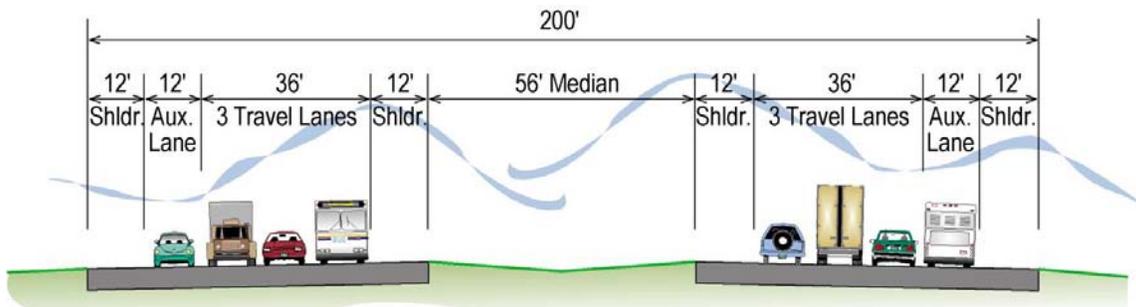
Package A Typical I-25 Cross Section - SH 60 to SH 66
